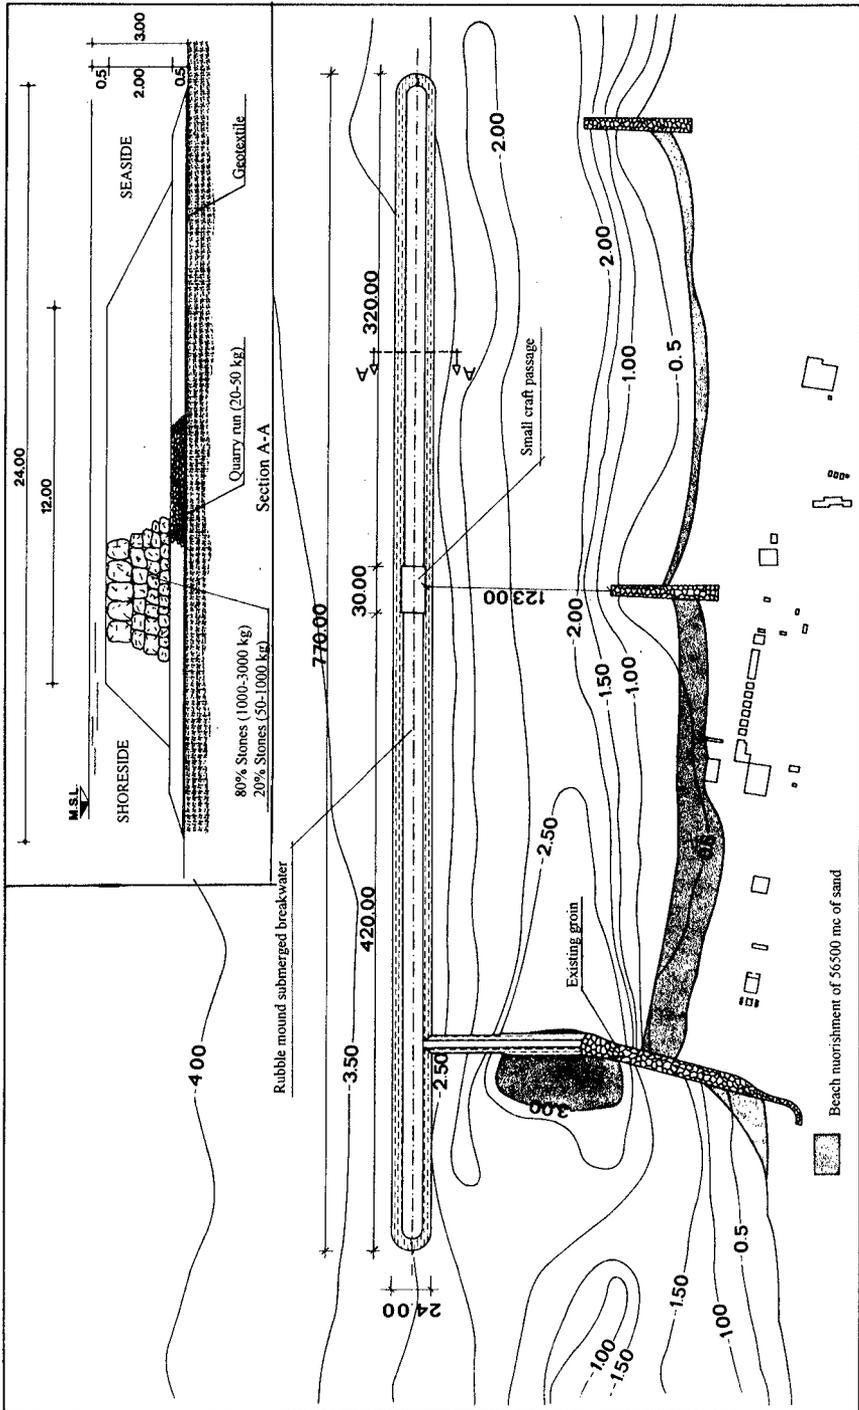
Protected nourishment at Lido di Dante (RA, Emilia Romagna): plan of the area and section of the submerged breakwater.
